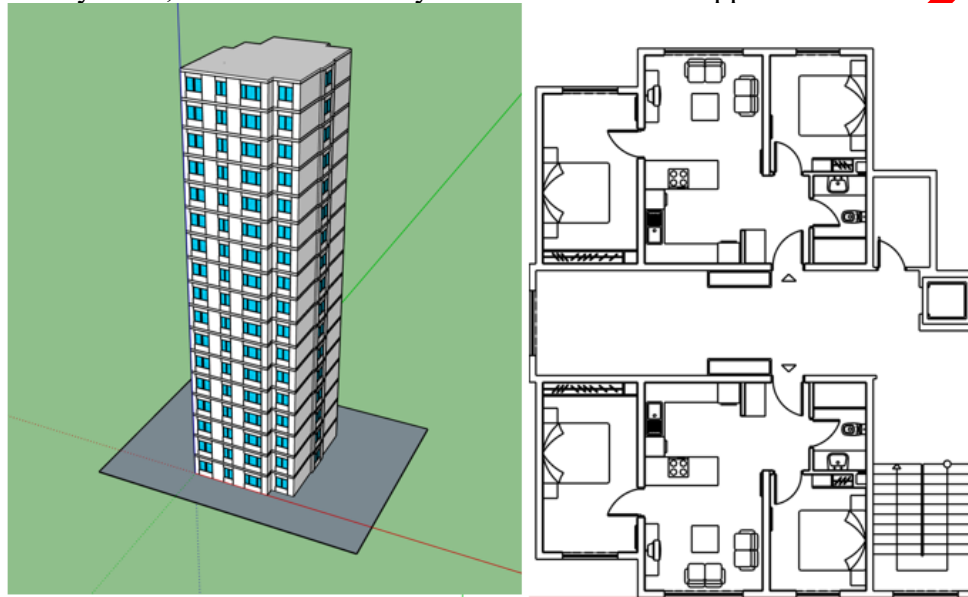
The 3D model (left) and architectural plan (right) of the case building
